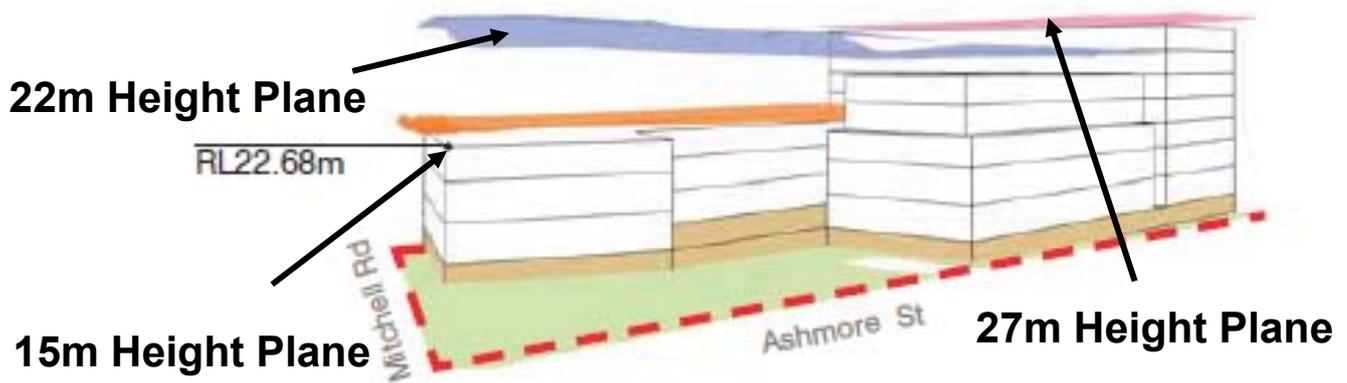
Approved Block B building envelope shown in relation to the SLEP 2012 height planes
